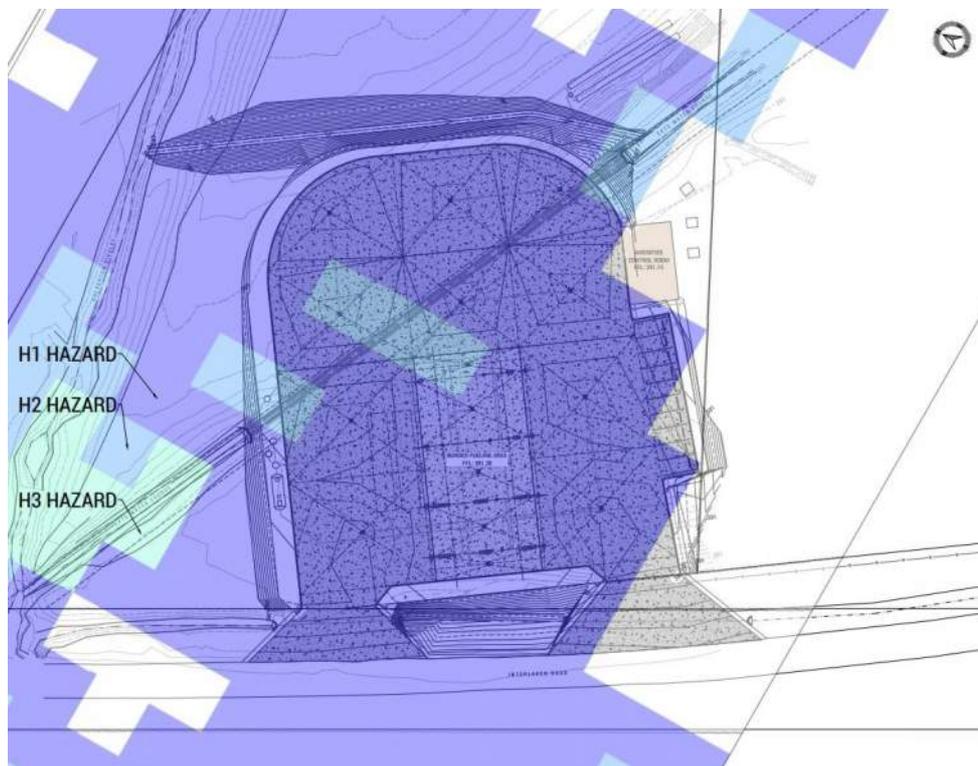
1% AEP Hazard Flood Mapping Overlay on Site Plan
